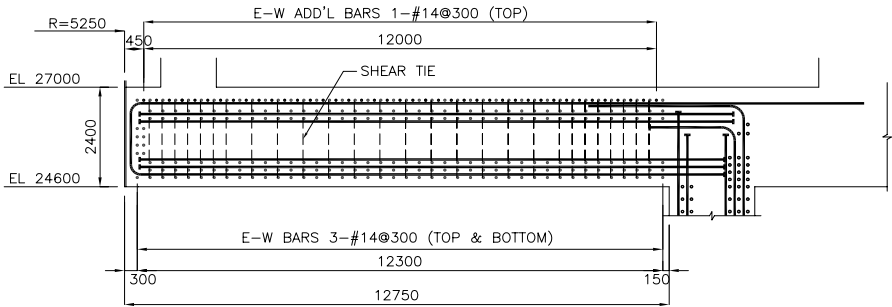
G.1-43. Reinforcing Steel of Suppression Pool Slab
